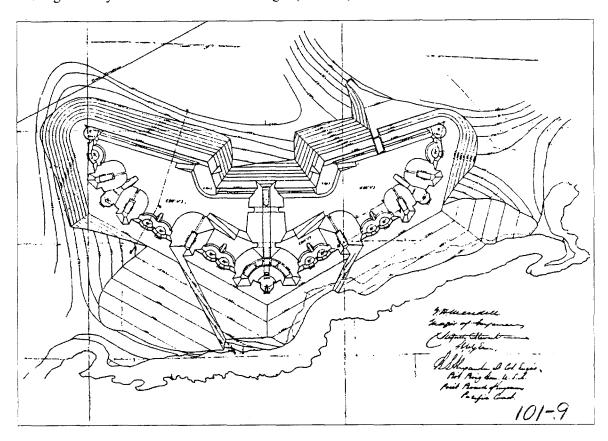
Cavallo Battery, Fort Baker, constructed 1872-1876. Plan of proposed works. Courtesy of the Park Archives of the Golden Gate National Recreation Area.
